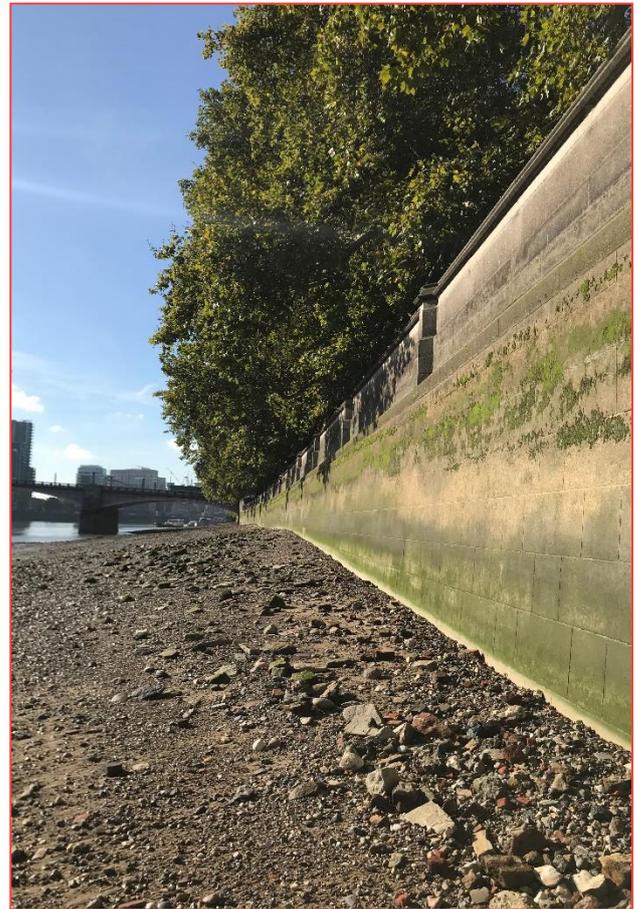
General Arrangement of Riverwall at Victoria Tower Gardens
